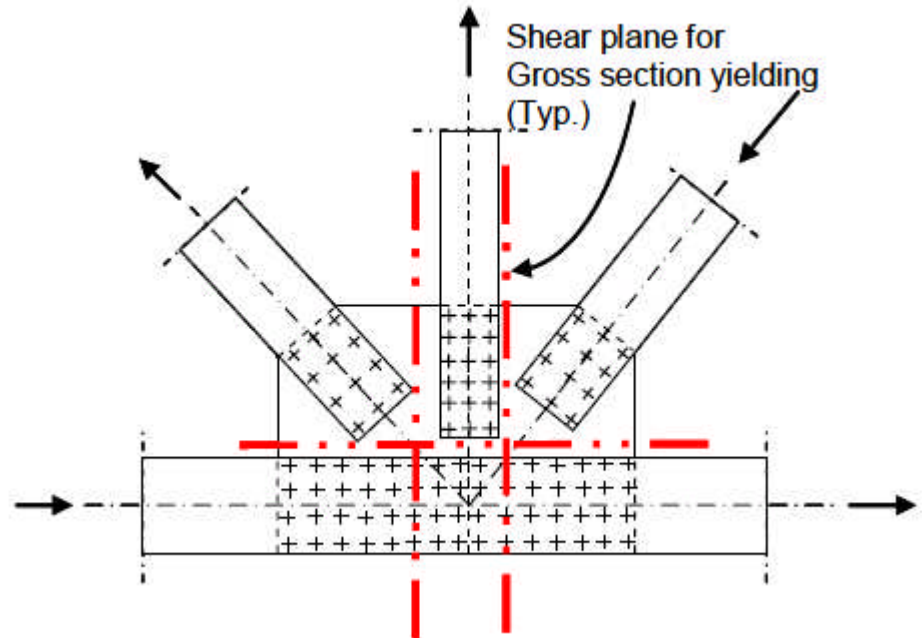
Examples of Gross Section Shear Yielding Planes
